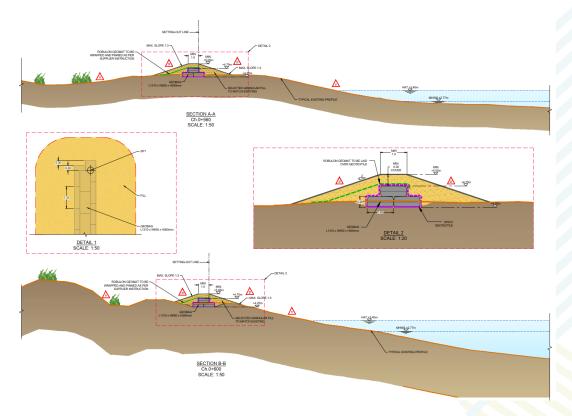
Cross section of proposed works at Green Bay (HR Wallingford, 2022)
